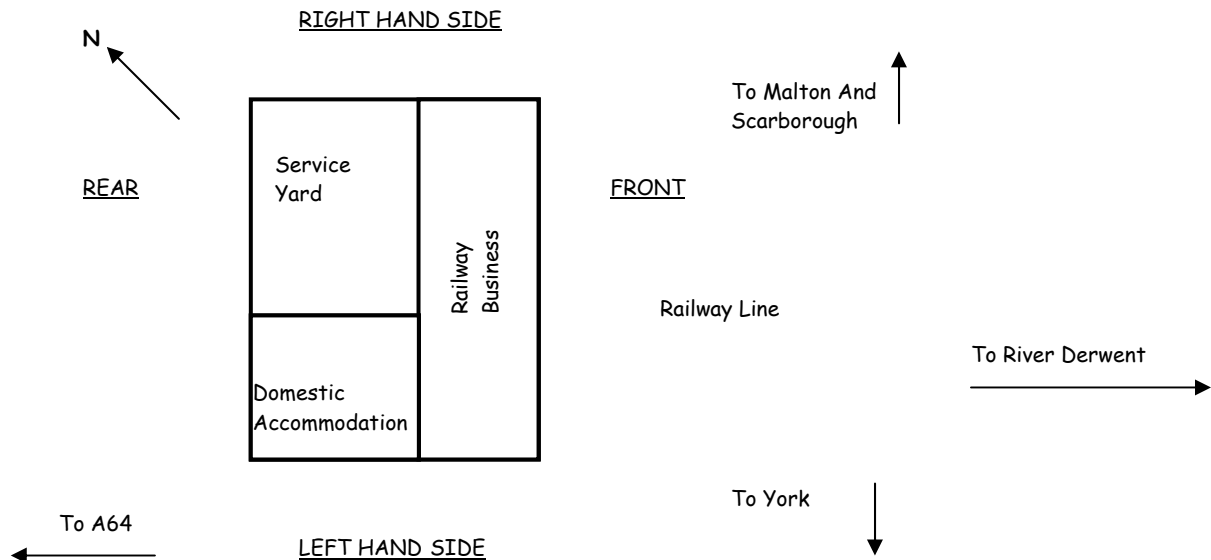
ORIENTATION OF THE BUILDING AND GENERAL LAYOUT
